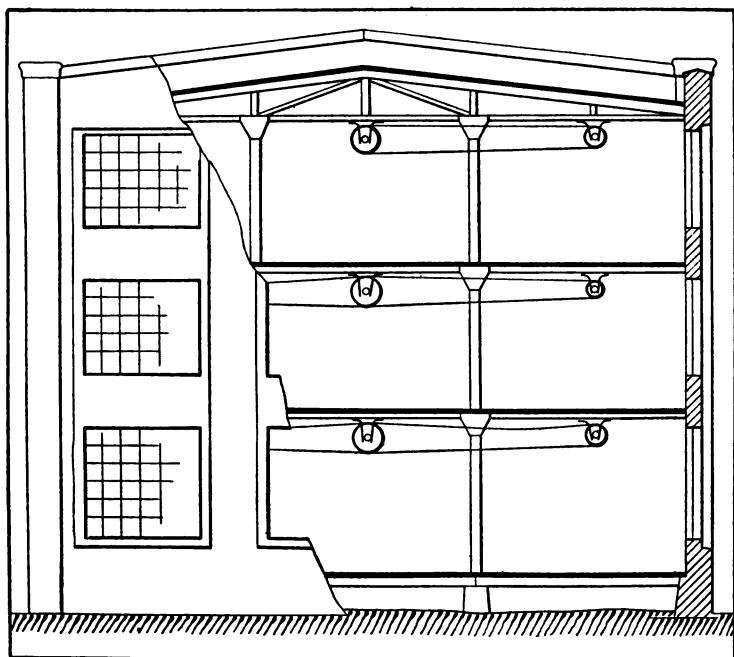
TYPE OF BUILDING USED IN MANUFACTURING WORK
